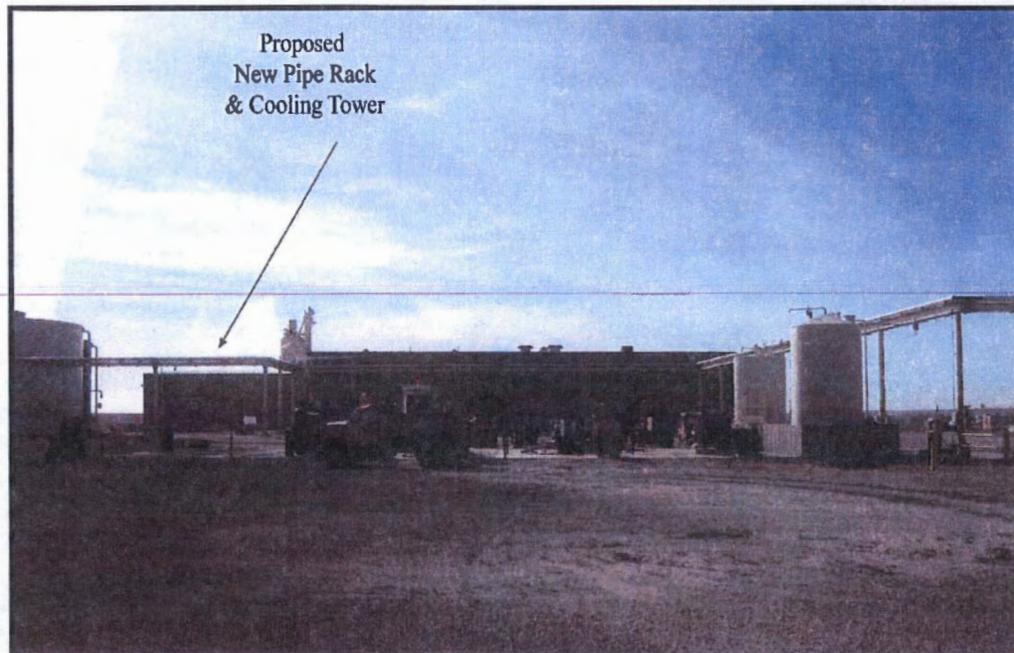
Project photo looking south at the existing pipe racks where the proposed pipe racks will be built. The newly proposed south tank farm will be constructed in the left foreground of the photo. The photo was taken on March 27, 2012, by Joni Stainbrook.
